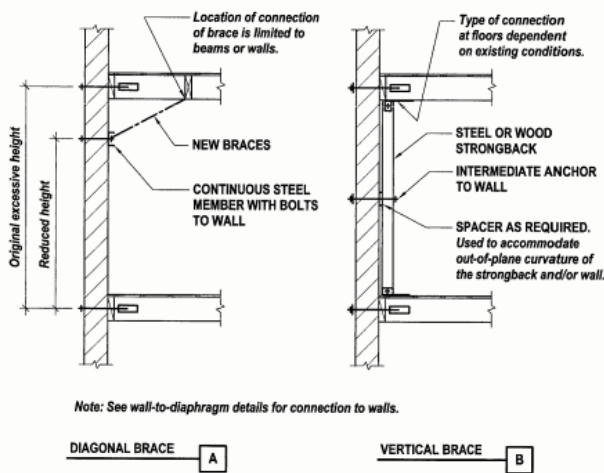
Exposed Out-of-Plane Wall Bracing
